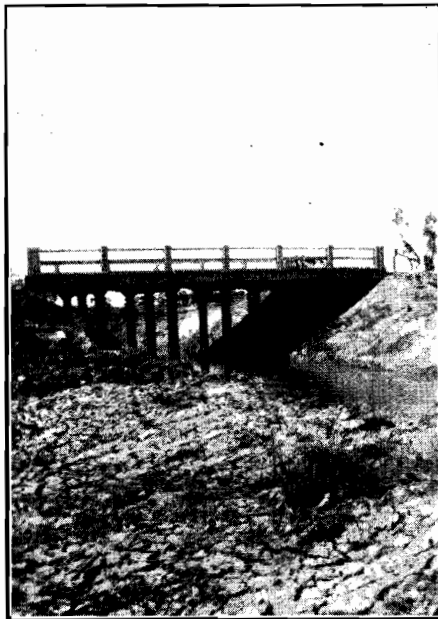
New bridge over Barr Creek on Murray Valley Highway, near Cohuna Township.
